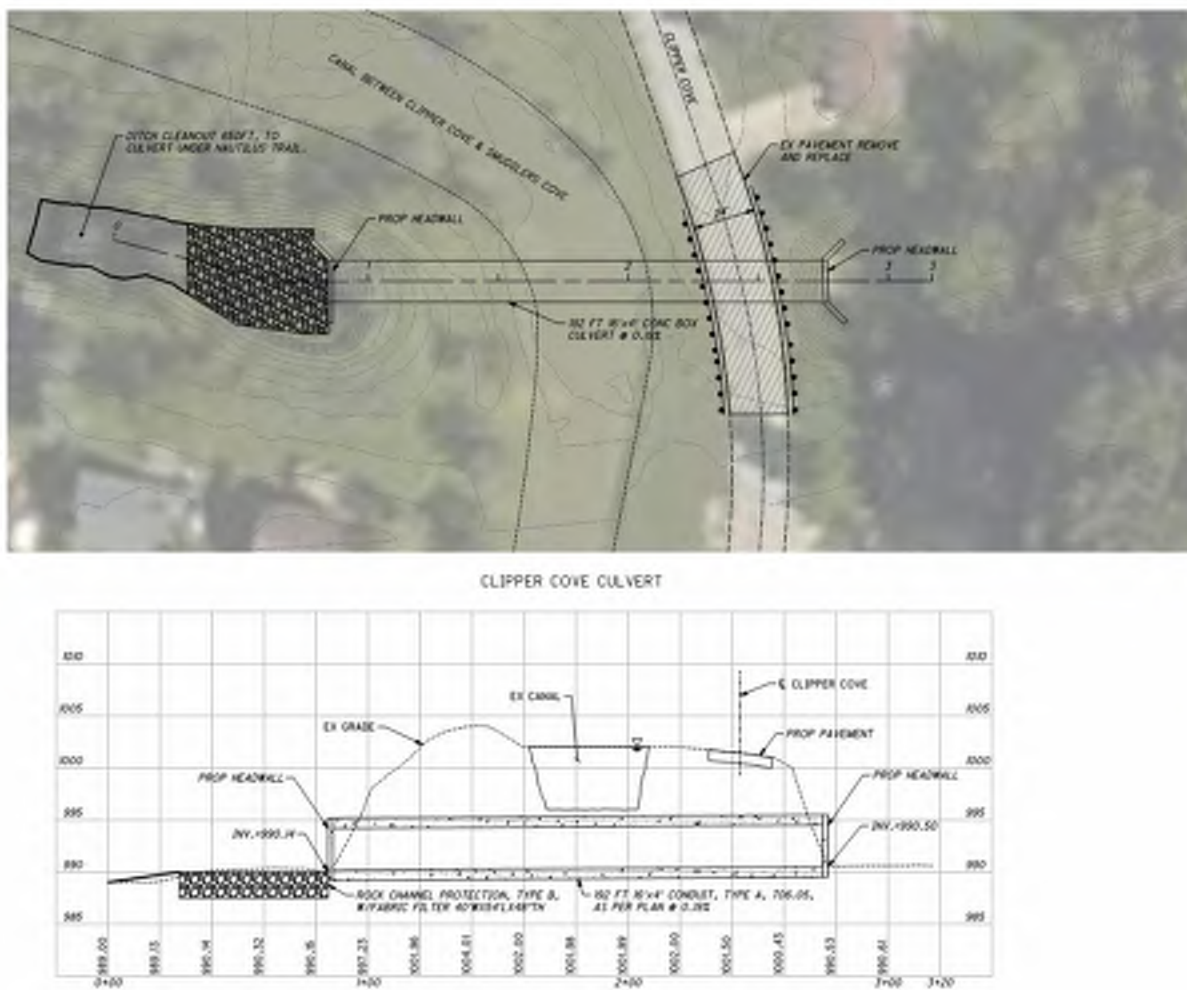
Preliminary Design of Proposed Clipper Cove Culvert
